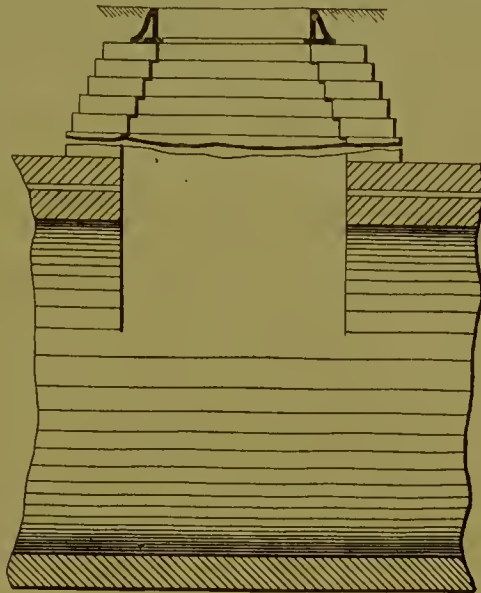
Manhole on Sewer Invert Blocks. Longitudinal Section.
